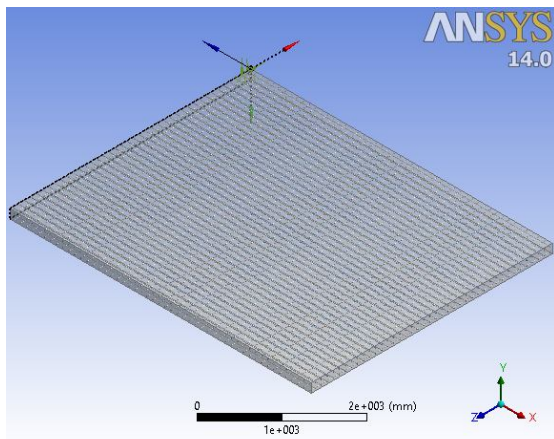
Arrangement of bars in bubble deck slab (isometric view)
